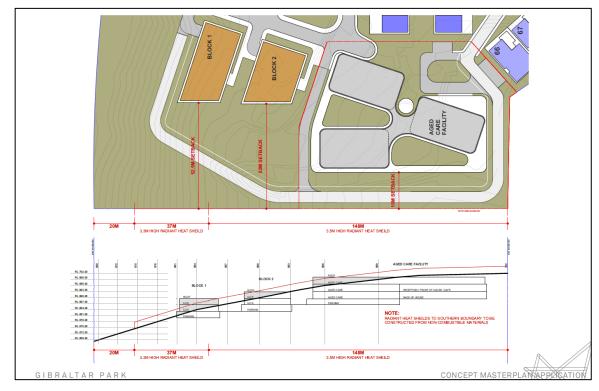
Stage 2 Concept Masterplan showing Bushfire Plan and position of Radiant heat walls.
